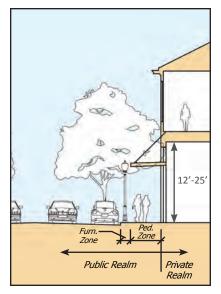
Cross Section, Chinatown Shopfront Frontage (Illustrative)
